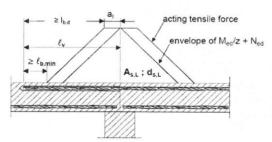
Anchoring of reinforcement to cover the line of acting tensile force
